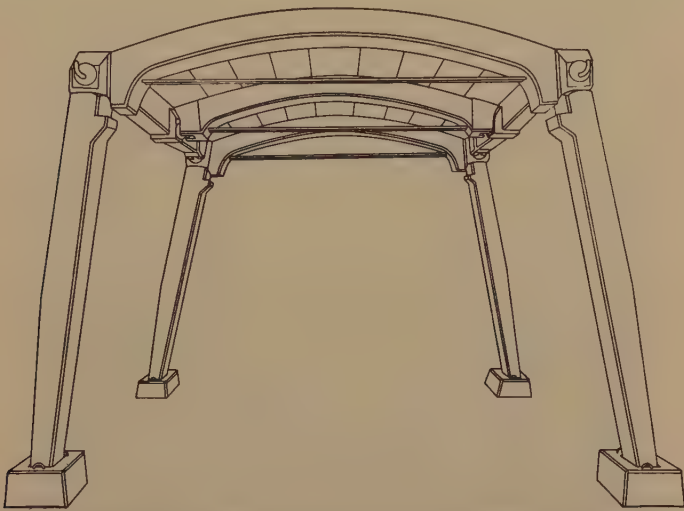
COMPLETE PRECAST CONCRETE SUPPORT SET, MUSPRATT SYSTEM.
